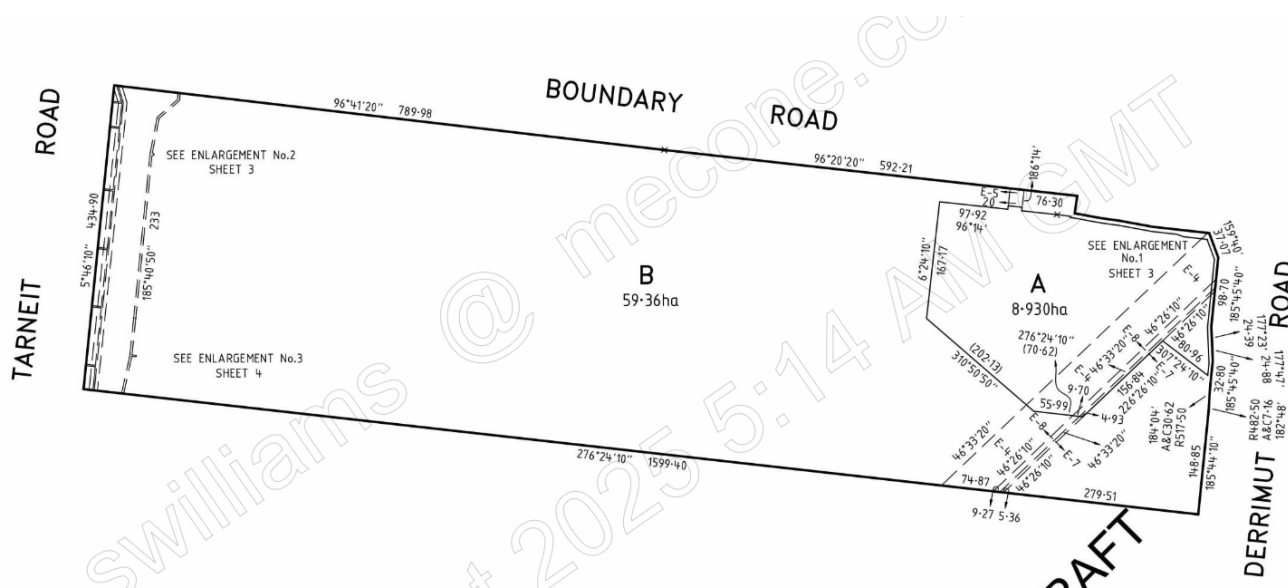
Excerpt of proposed Plan of Subdivision, where the Subject site is shown as Lot A (Source: Powercor, 2025)
